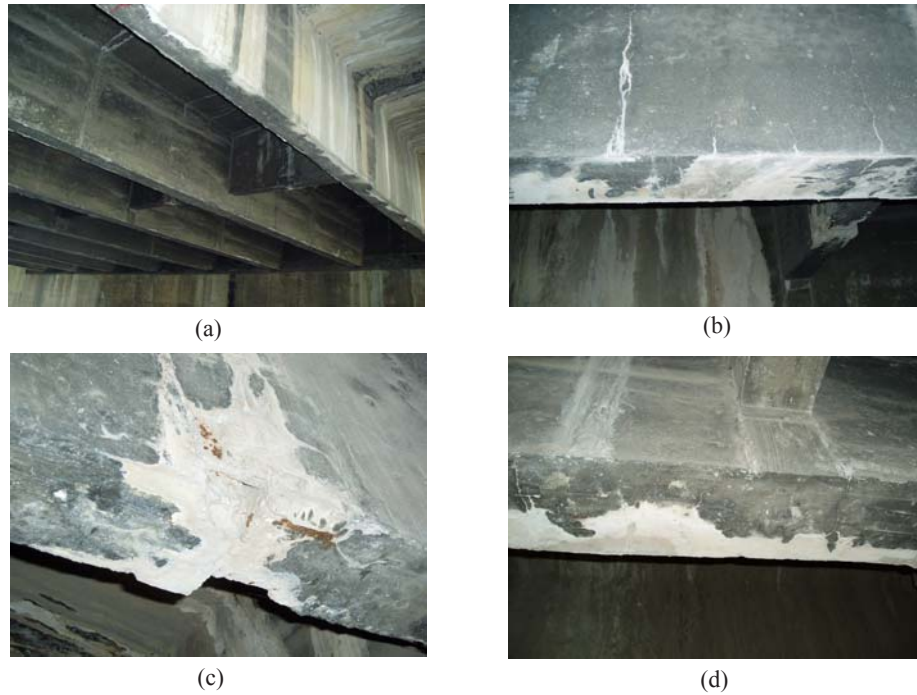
Damages of RC bridge. (a) Leakage; (b) Cracking; (c) Corrosion of steel and spalling of concrete; (d) Leakage and cracking
